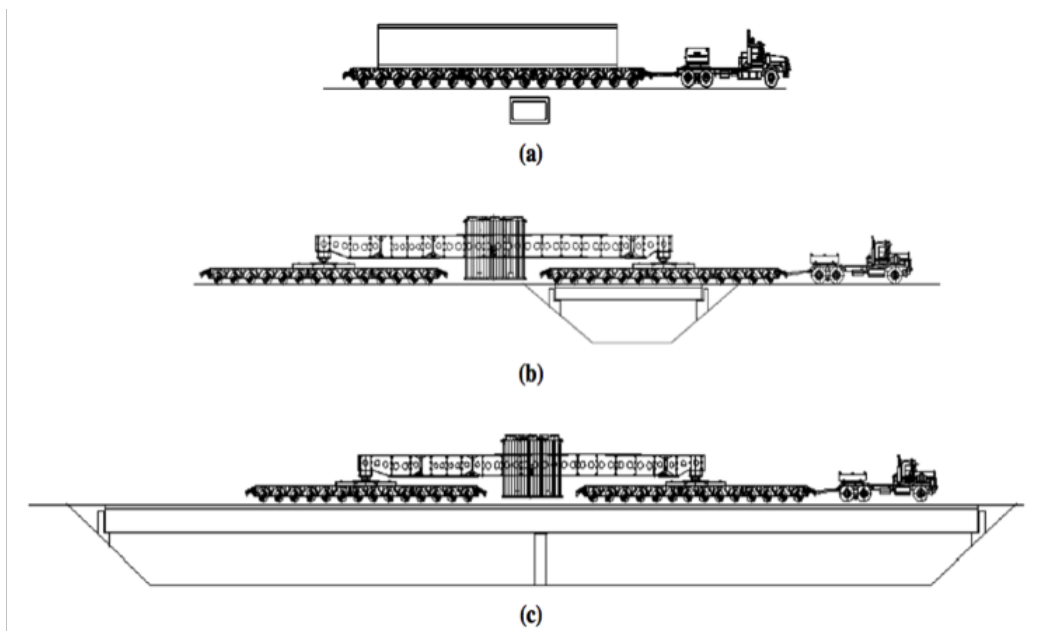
Effect of trailer configuration on structures: (a) culvert crossing, (b) medium-span bridge crossing, and (c) long-span bridge crossing⁶⁸
